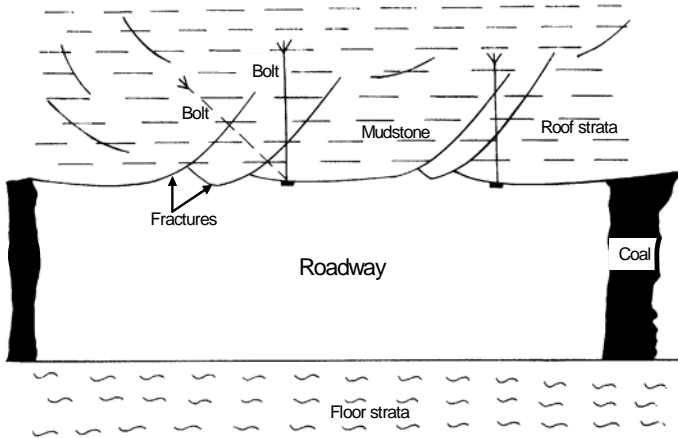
Additional rock bolts needed when the roof strata contain large fractures. The bolts should be perpendicular to the strike of the fractures and penetrated the fractures.
